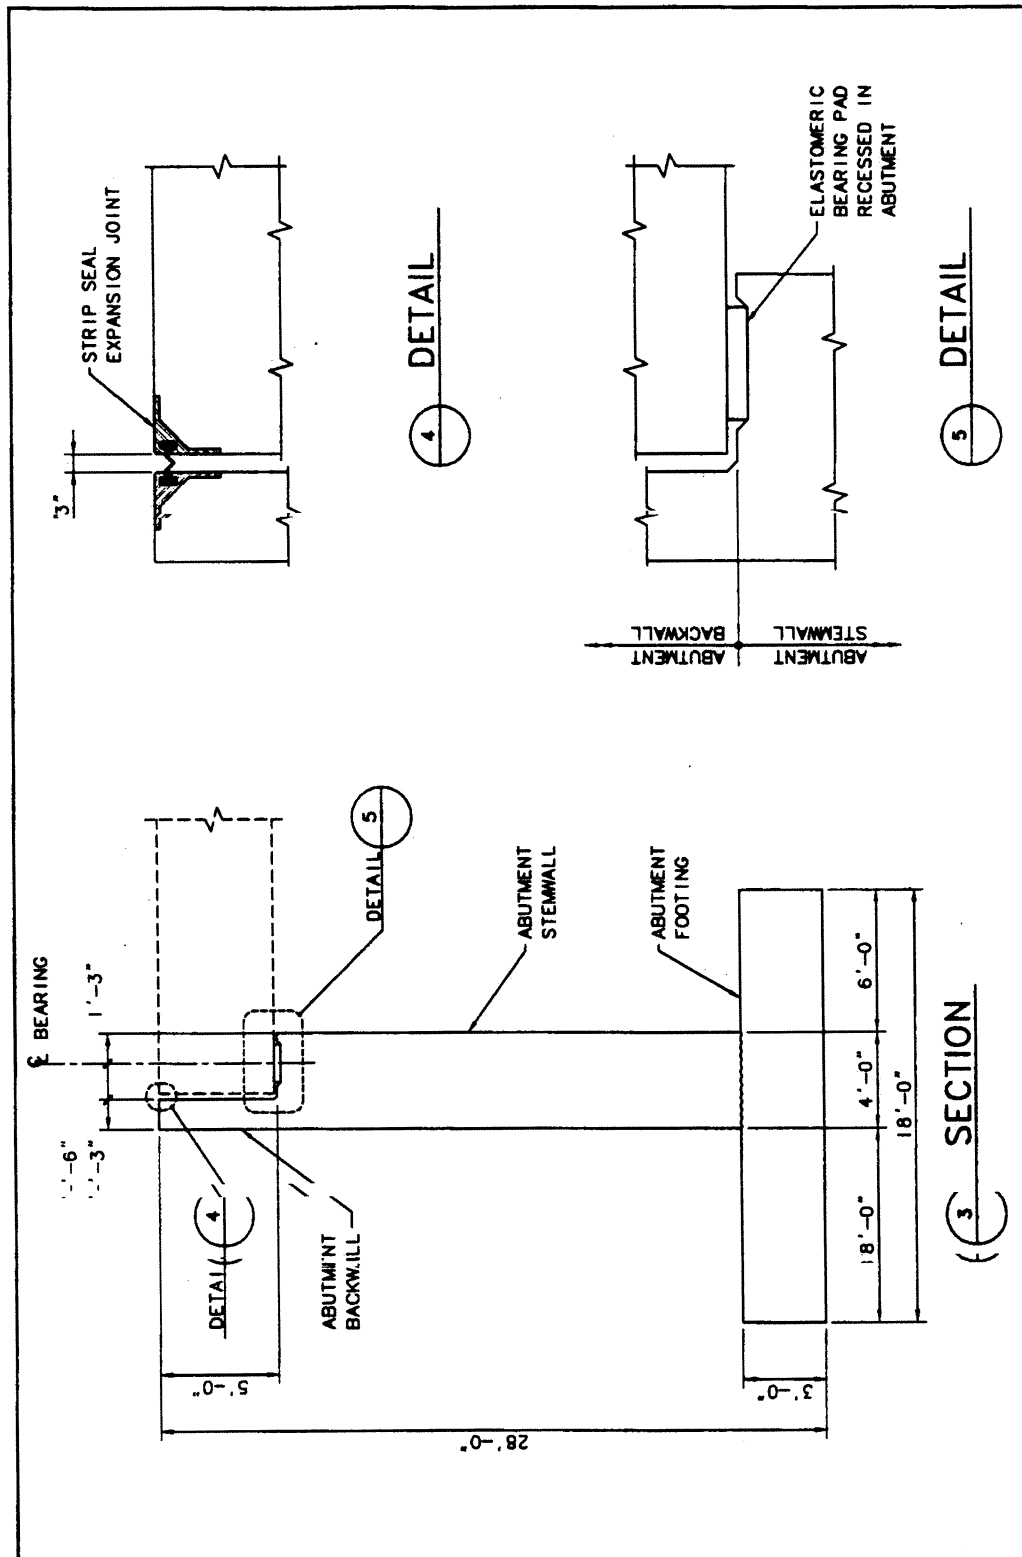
Bridge No. 3 - Abutment Section and Details
